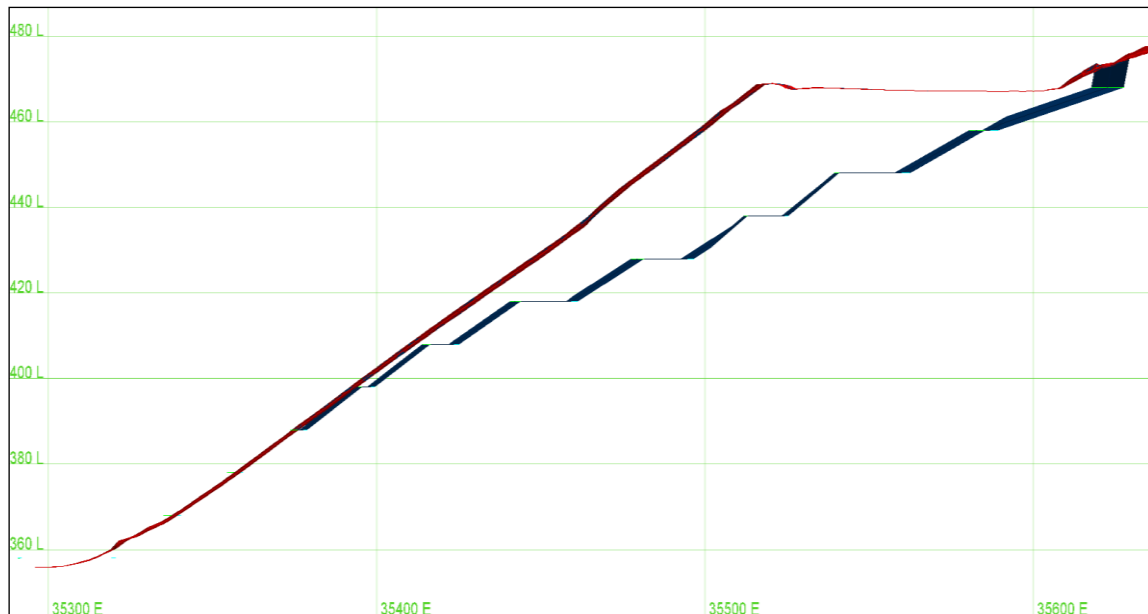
37. The cross sectional showing bench layout (Pit resource)
